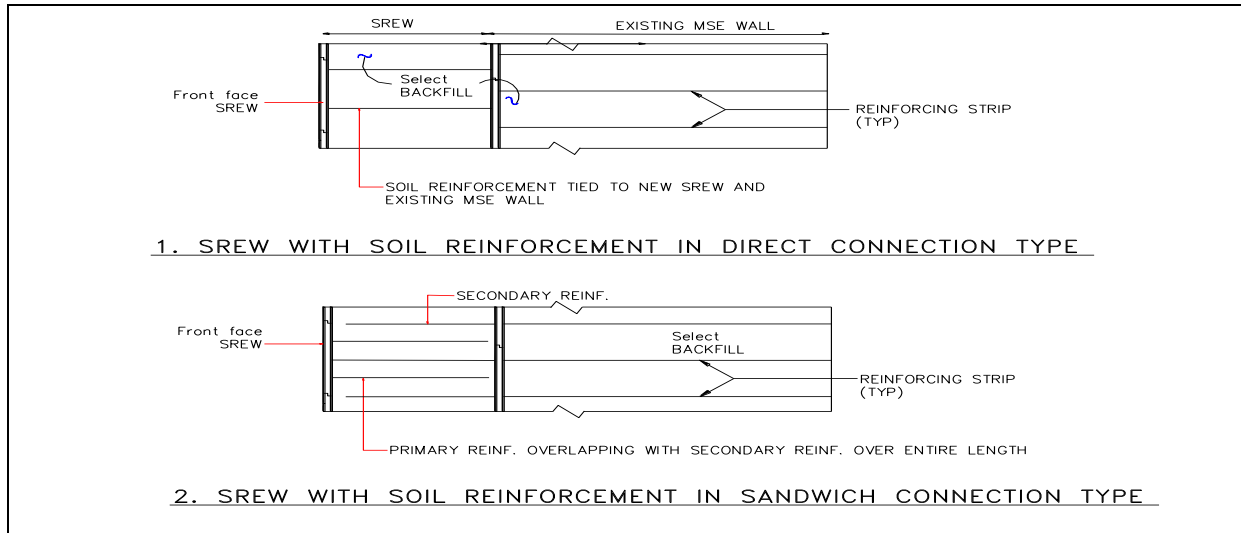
Two types of soil reinforcements configuration within the SREW wall: 1) DIRECT connection and 2) SANDWICH connection
